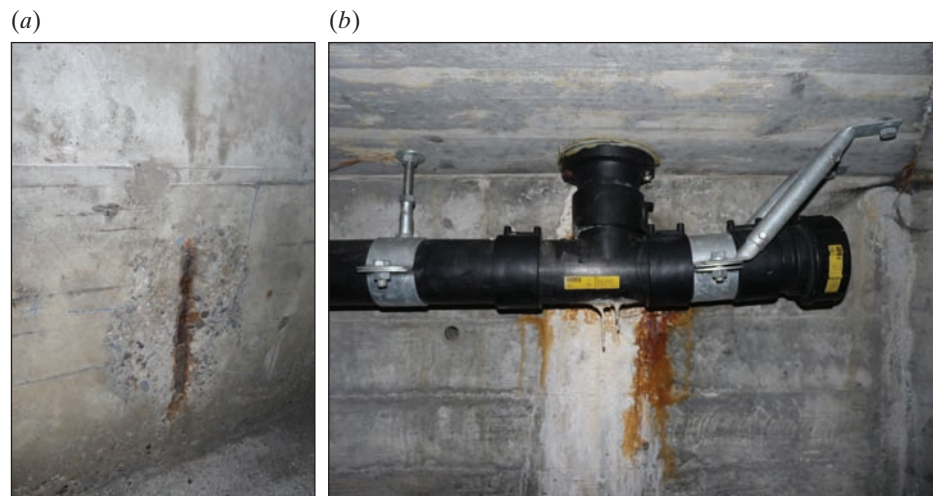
Corroded reinforcement (a) and leaking penetration of a drain pipe (b)
